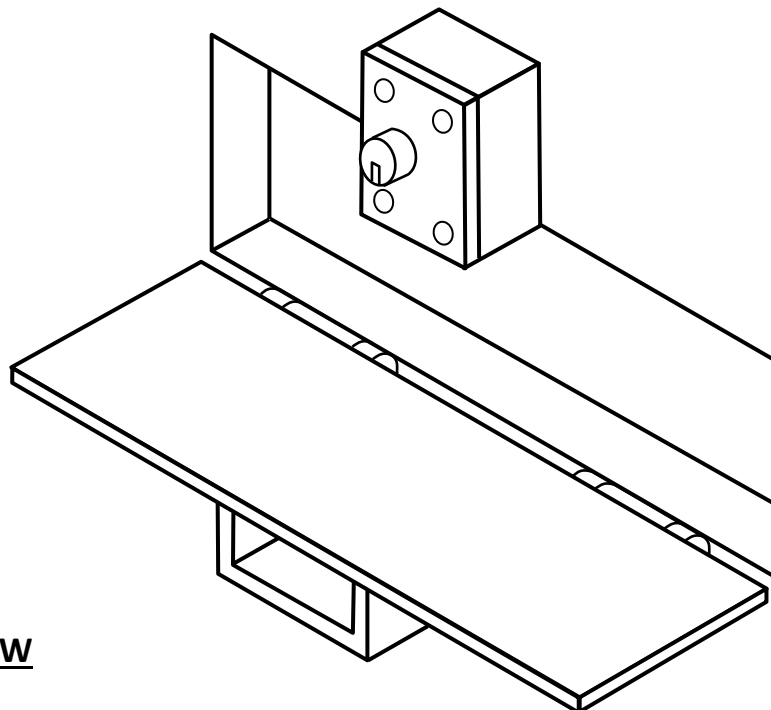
TYPICAL DD2 SLIDING CELL DOOR – DETAILS 2
